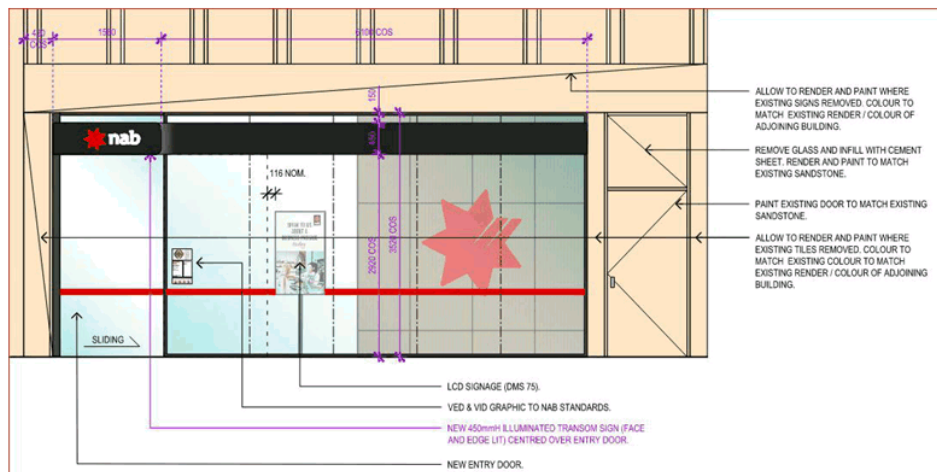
three new (discretionary) window signs located on the building's facade facing the Elizabeth Street Mall
